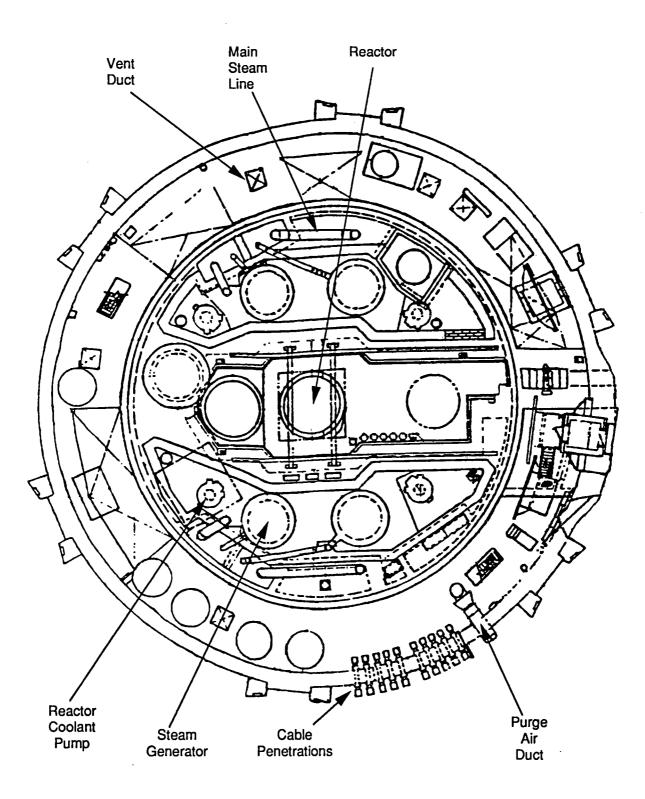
Zion 1 Containment, Elevation 617'0"
